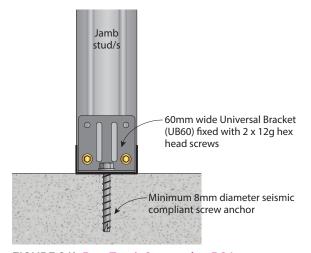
BaseTrack Connection BC4Heavy Duty Connection for 64mm and 76mm studs
